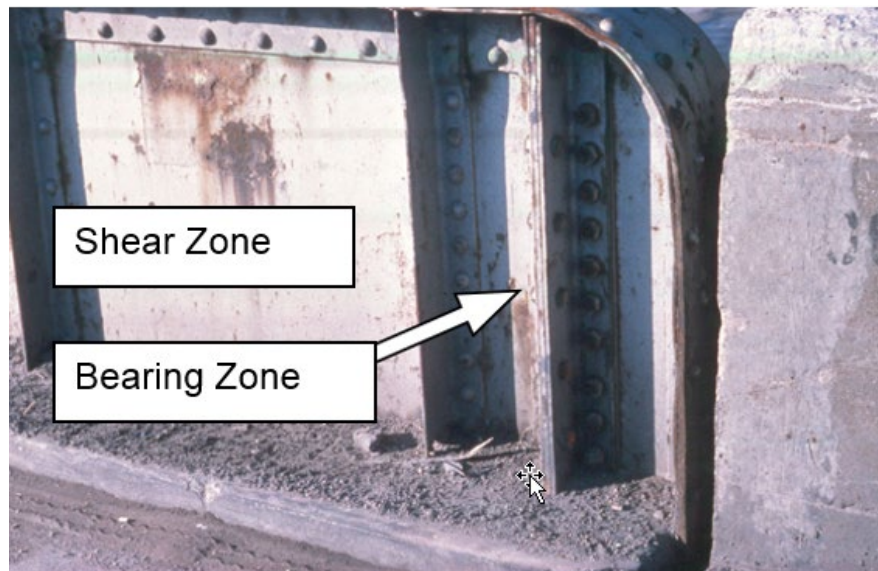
Web Area Near Support on a Through Girder Bridge
